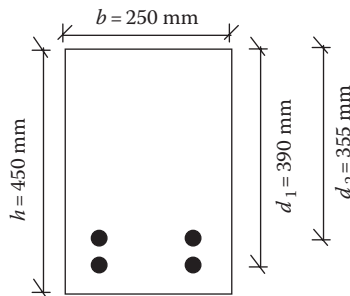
FRP RC beam with multiple reinforcement layers.
